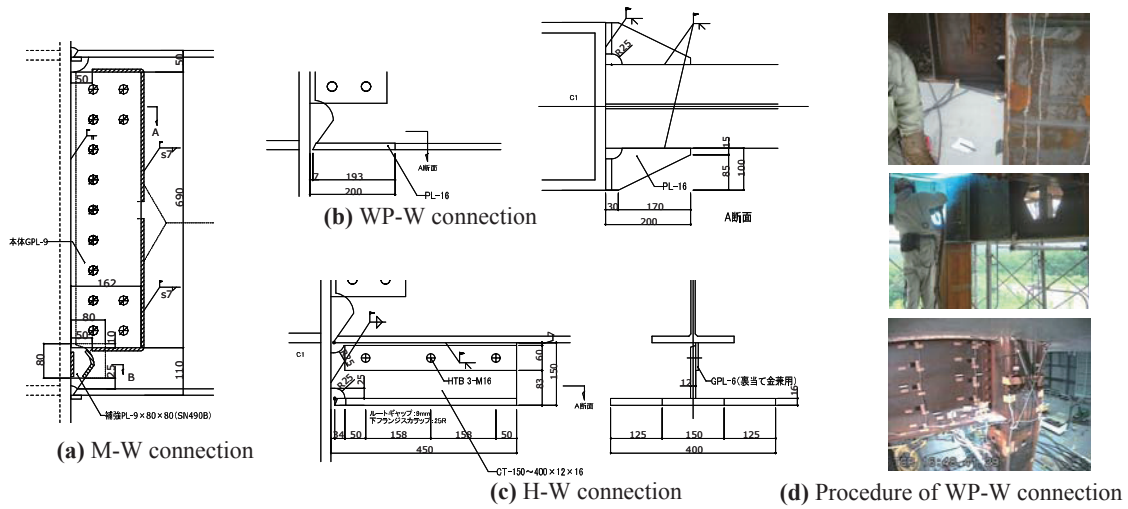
Reinforcement of field-welded beam-to-column connection
